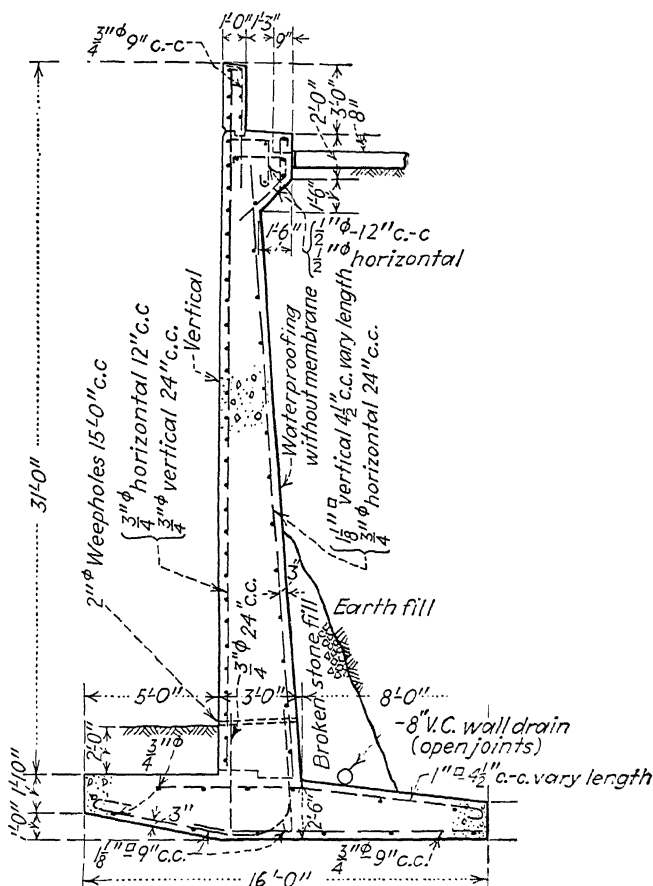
Retaining wall designed for the connection to the Harlem River Speedway, Highbridge Park, New York City.
